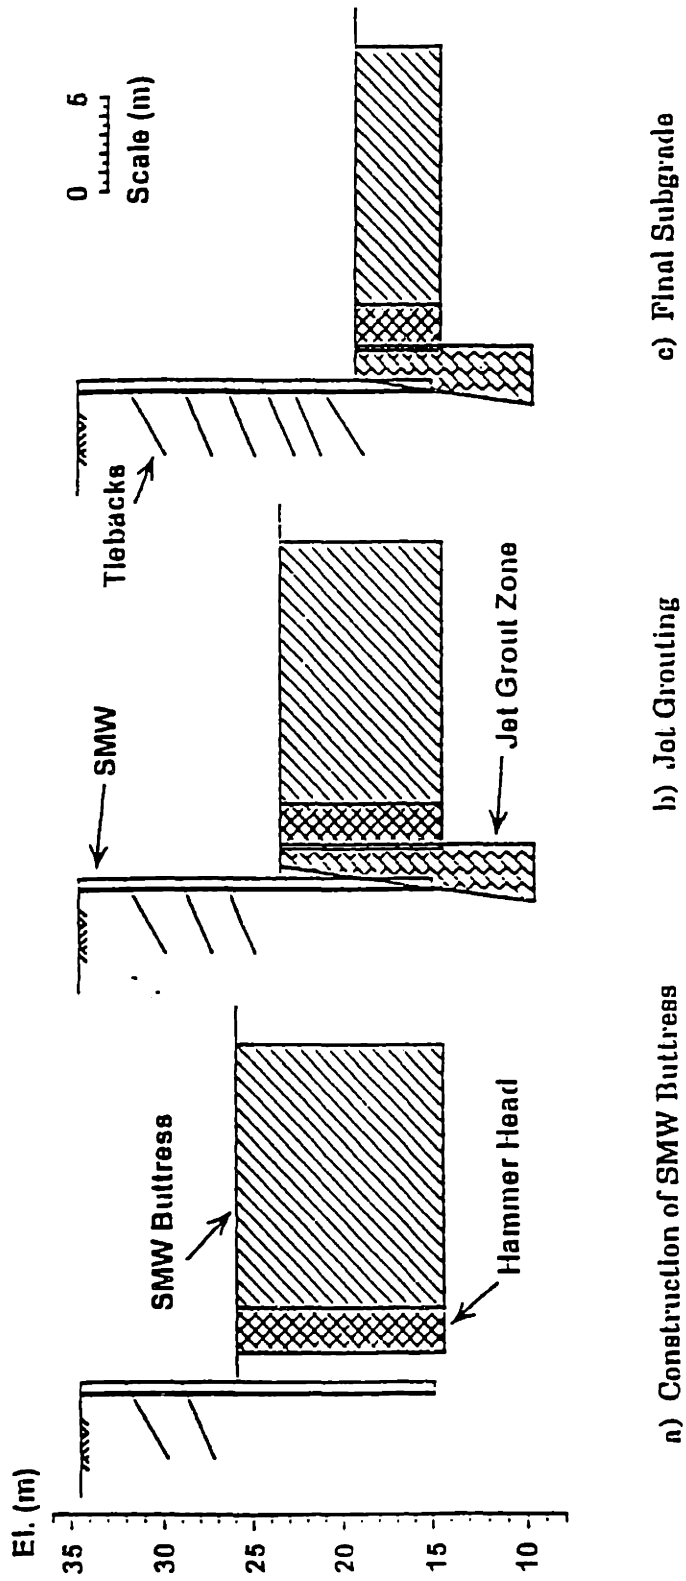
Profile view of basal stabilization scheme at West wall, Section B-B' (after O'Rourke and O'Donnell, 1997b)
